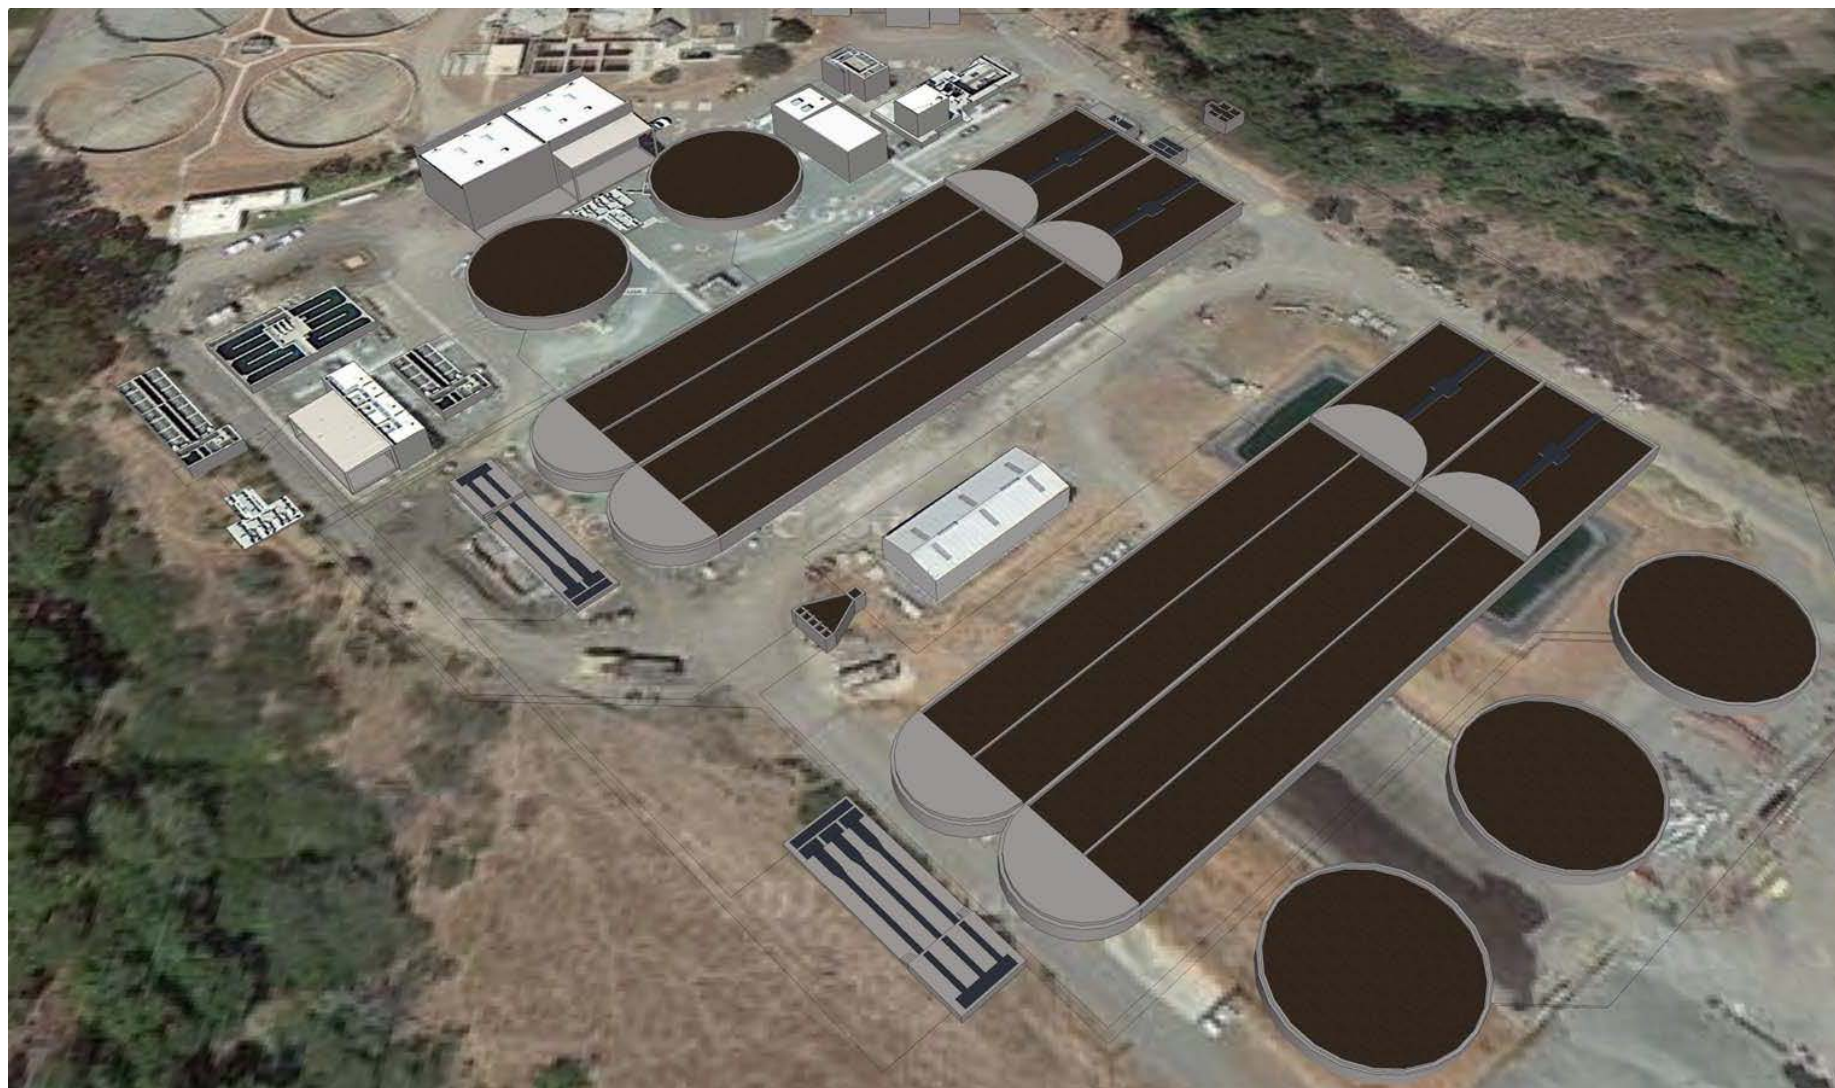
shows a rendering of the proposed site layout. Additional renderings are provided in Appendix C.
